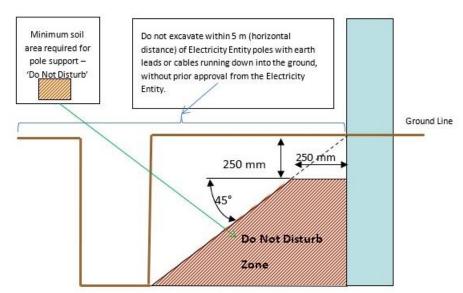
Do Not Disturb Zone requirements when excavating near poles
